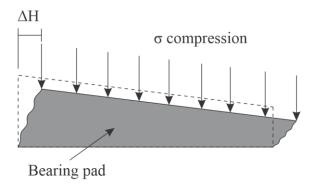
Horizontal deflection in tapered bearing pad under axial compression
